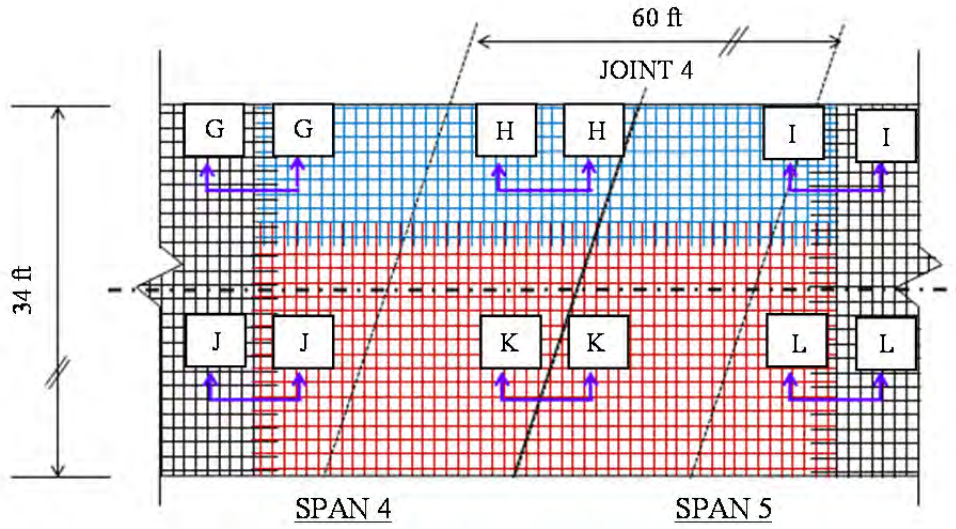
Details of longitudinal splices, Lampasas River Bridge (Span 4 and Span 5)
